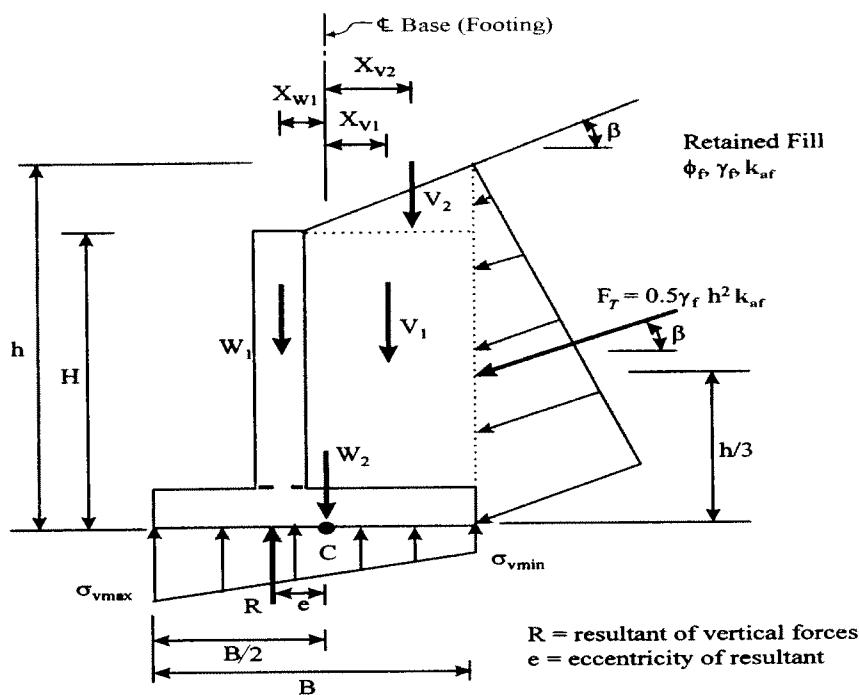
Bearing Stress Criteria for Conventional Wall Foundations on Soil.
